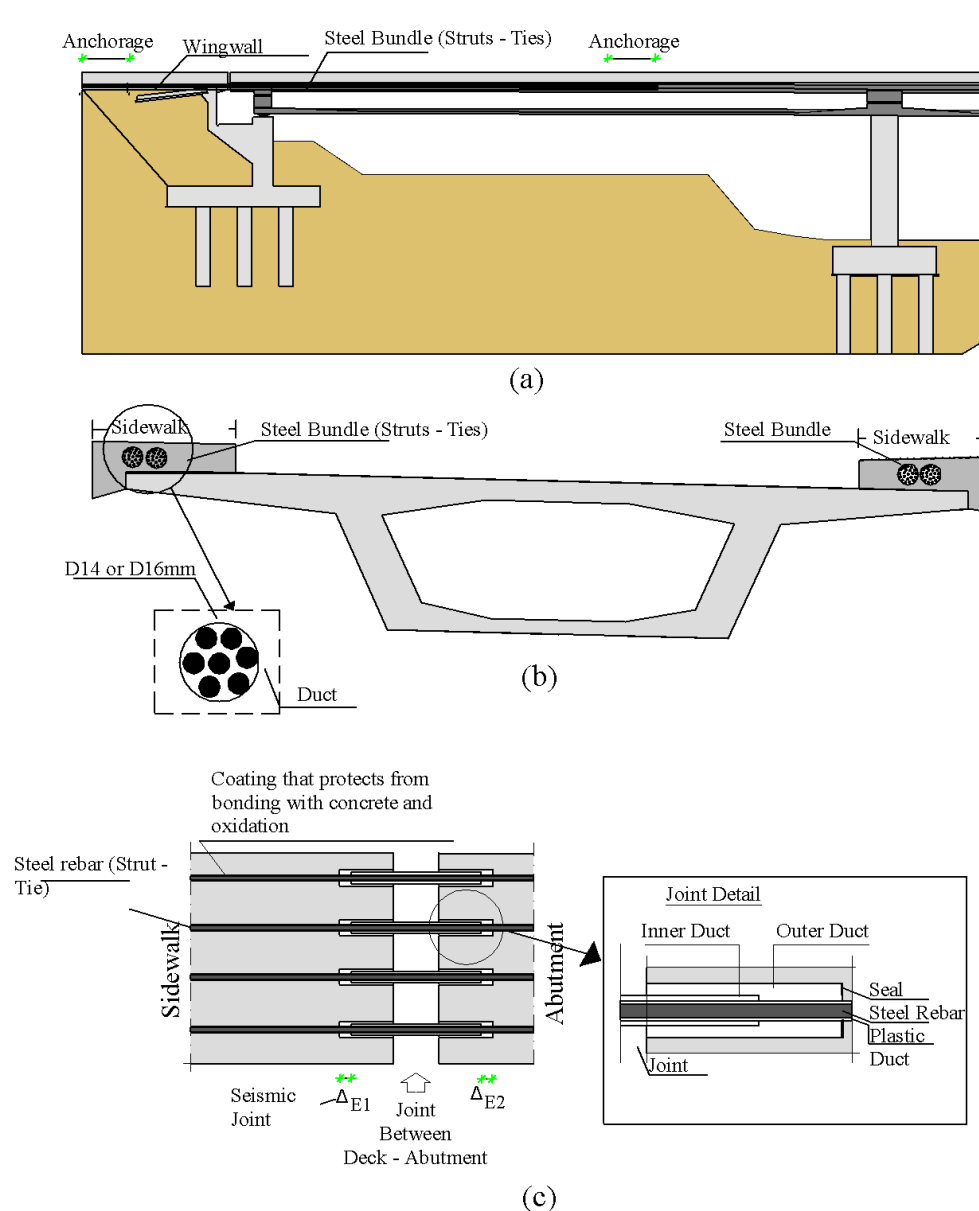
Restraining System. a. Longitudinal view of the bridge, b. Detail 1: cross section of the deck of the bridge, c. Detail at the Expansion Joint between Deck and Abutment
